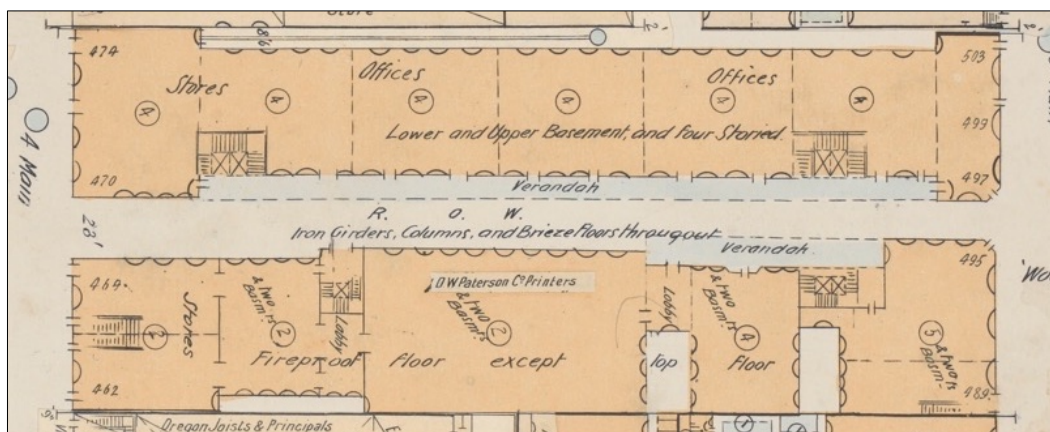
A 1910 Mahlstedt fire insurance plan of the Rialto and Winfield Buildings. The plan provides rare evidence of the early layout of the Winfield Building. Behind the five storey front wing was light-court and 4 storey wing with two basement levels, decreasing in height 2 storey warehouses with fireproof floor construction. Source: State Library of Victoria.
